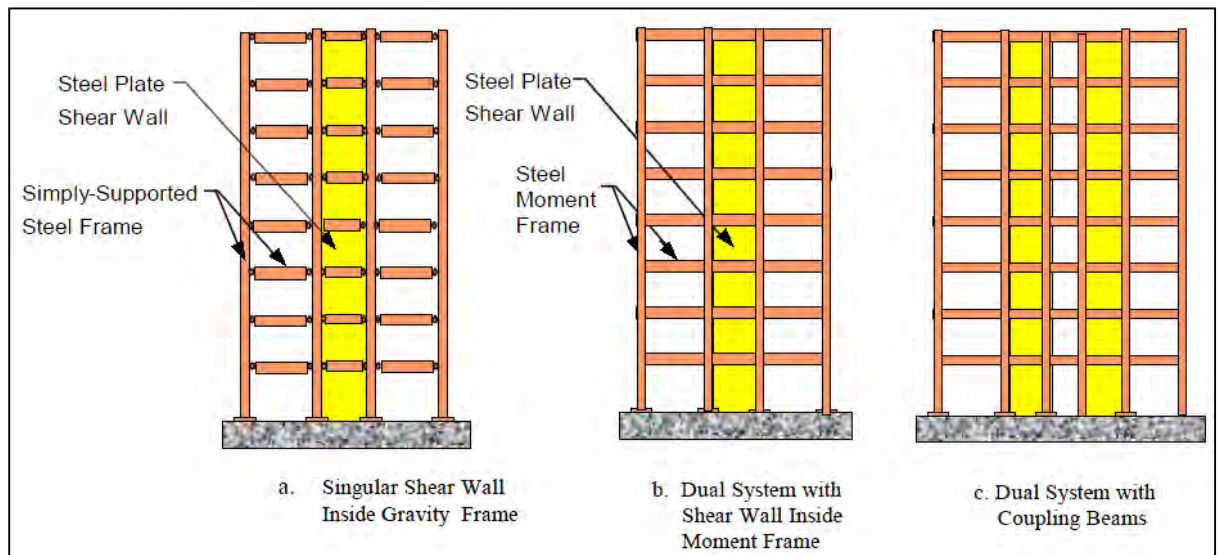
2 Use of steel shear wall in different structural system (Astaneh et al. 2001).
